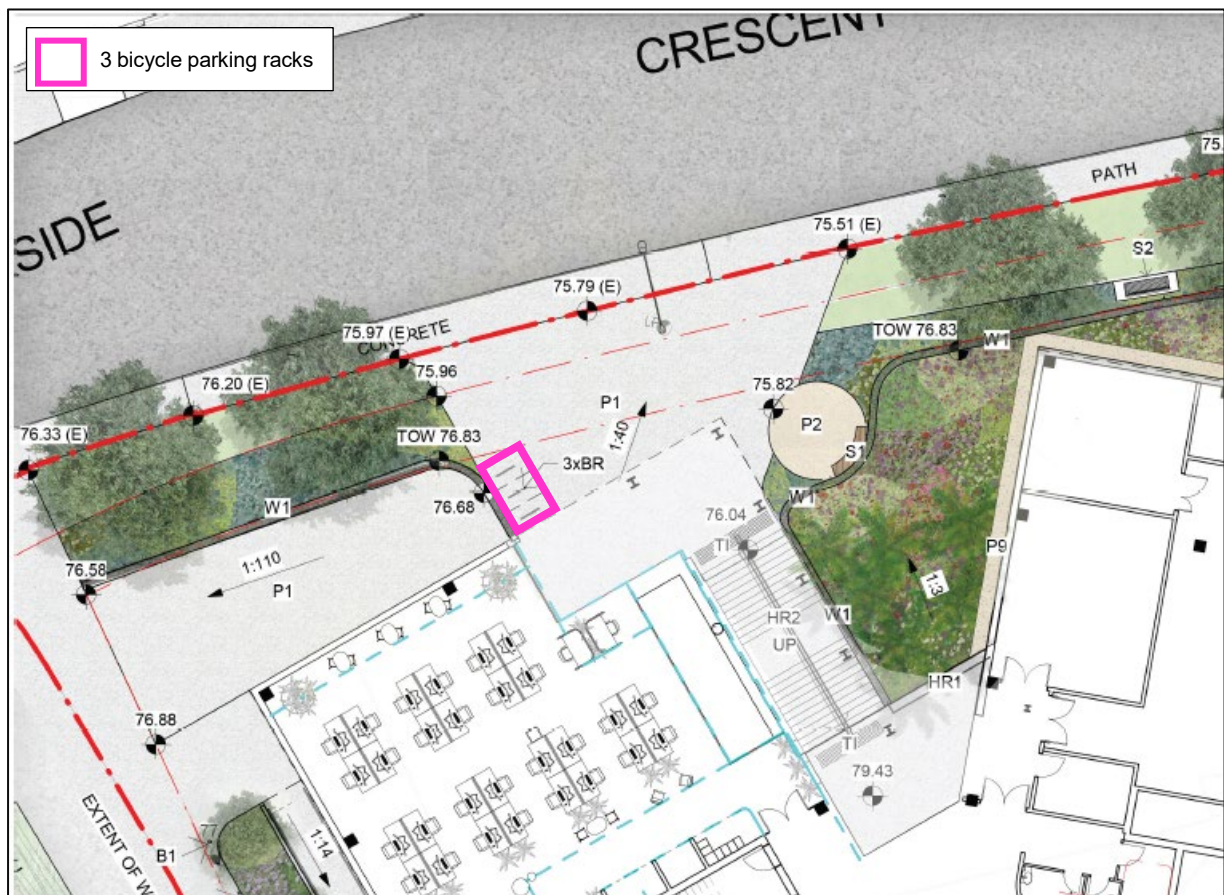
Original landscape plan illustrating three bicycle parking racks on Parkside Crescent. Source: Turf
